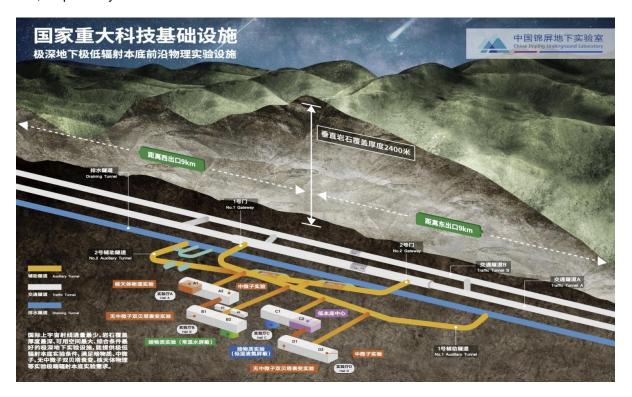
Underground structure of JinPing Underground Research Lab, China (Yue, 2023)
